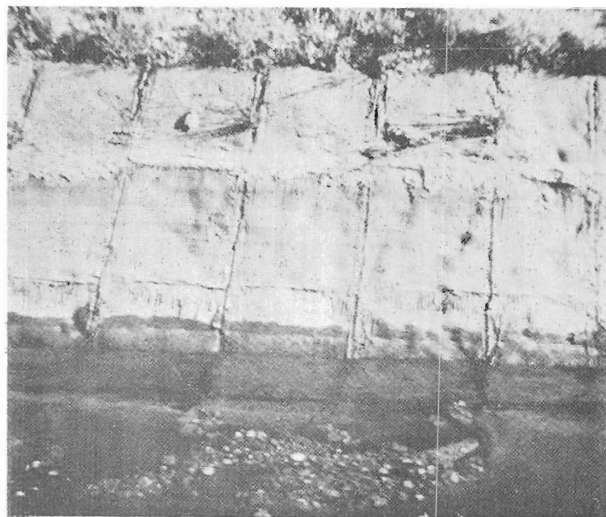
A lining constructed of hot-paving-mix asphaltic concrete prefabricated slabs. P3-D-15393.
